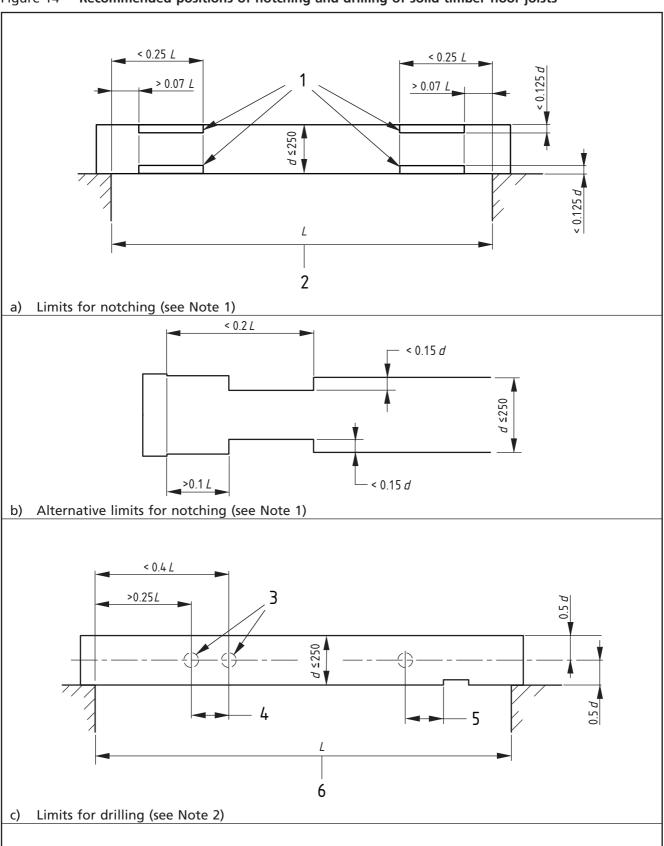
Recommended positions of notching and drilling of solid timber floor joists
